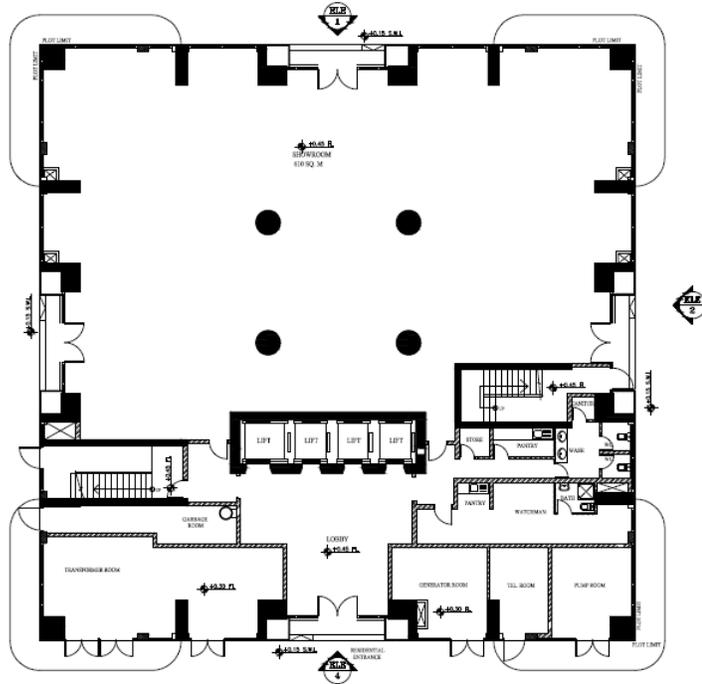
Ground floor plan. (Image source: CAD drawing)
